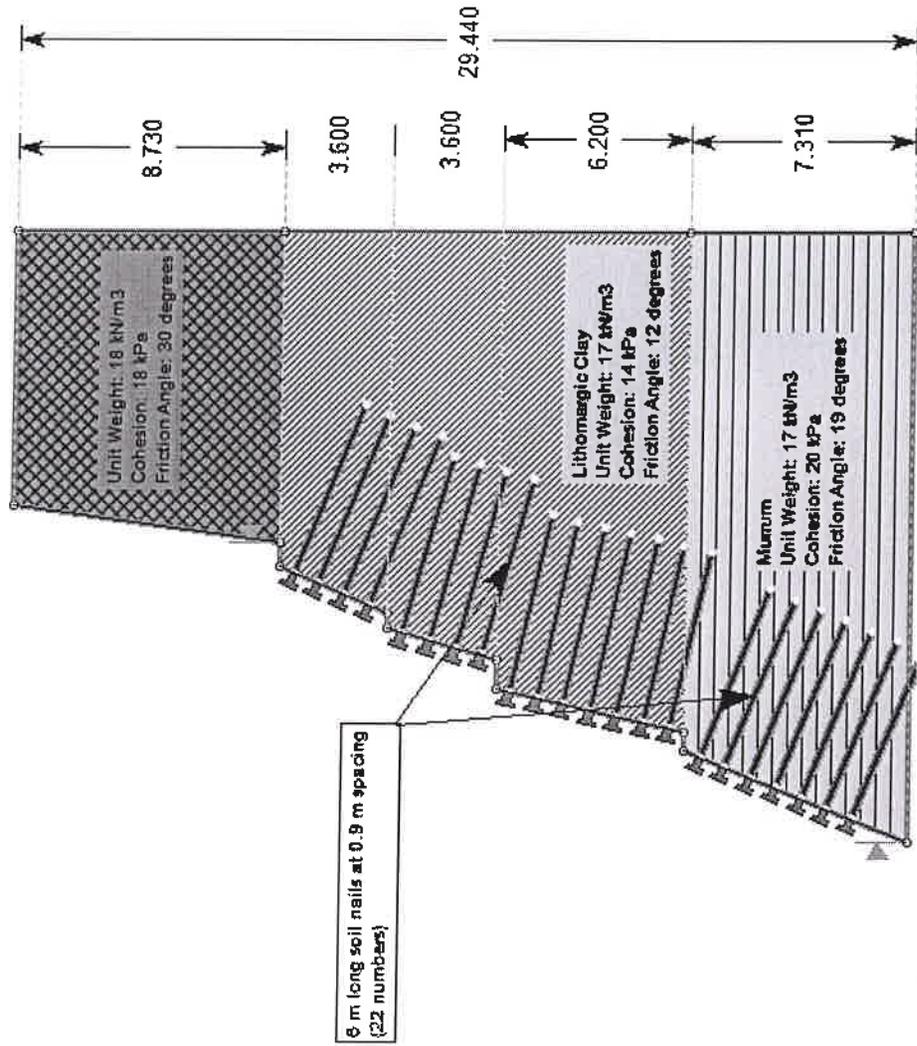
Cross-section of slope at 246.900 with remedial measure, providing 22 numbers of soil nails of 6 m length at spacing of 0.9m
